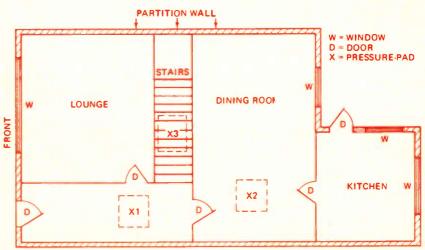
GROUND-FLOOR PLAN of a small house showing suitable positions (marked "X") for pressure-pad "spot" defenses.
